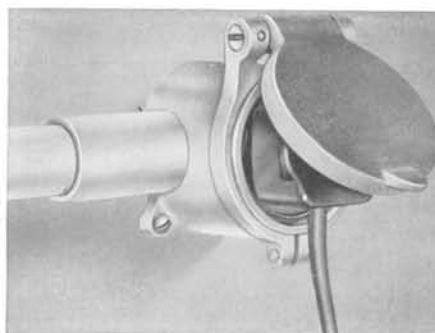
TYPICAL INSTALLATION OF KS-16151 JACK INSTALLED ON 1/2-INCH CONDUIT
